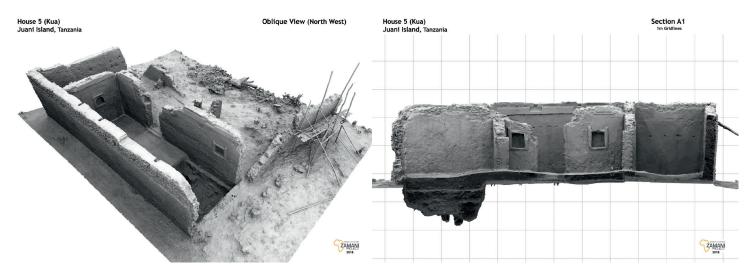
3D scan of House 5 and elevation/ section (a & b).
